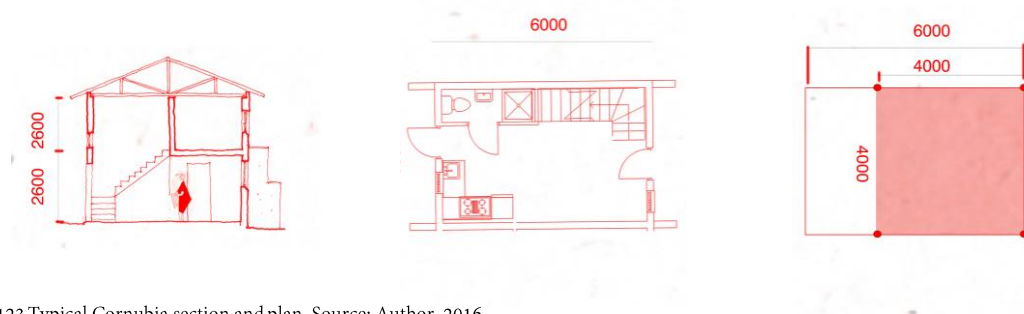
Typical Cornubia section and plan. Source: Author, 2016
